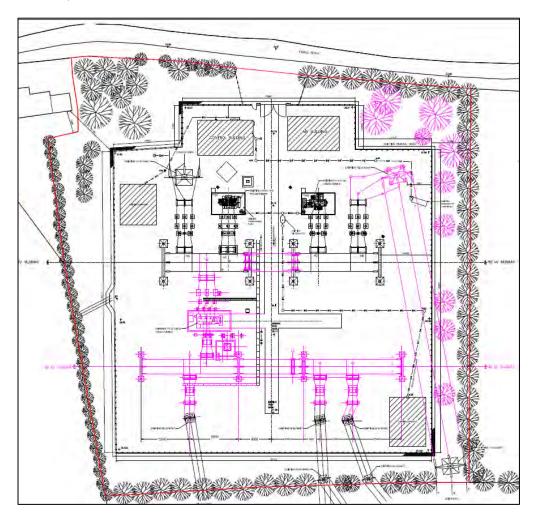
Site Layout: Proposed Works (Drawing No. PE492-D056-104-005-000)
